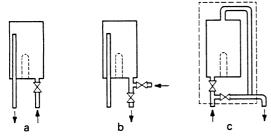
C — Open outlet water-heaters (see sub-clause 4.3)
